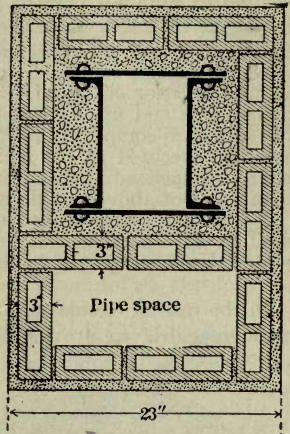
Hollow Tile Pipe Chase at Column, Chicago Savings Bank Building.
